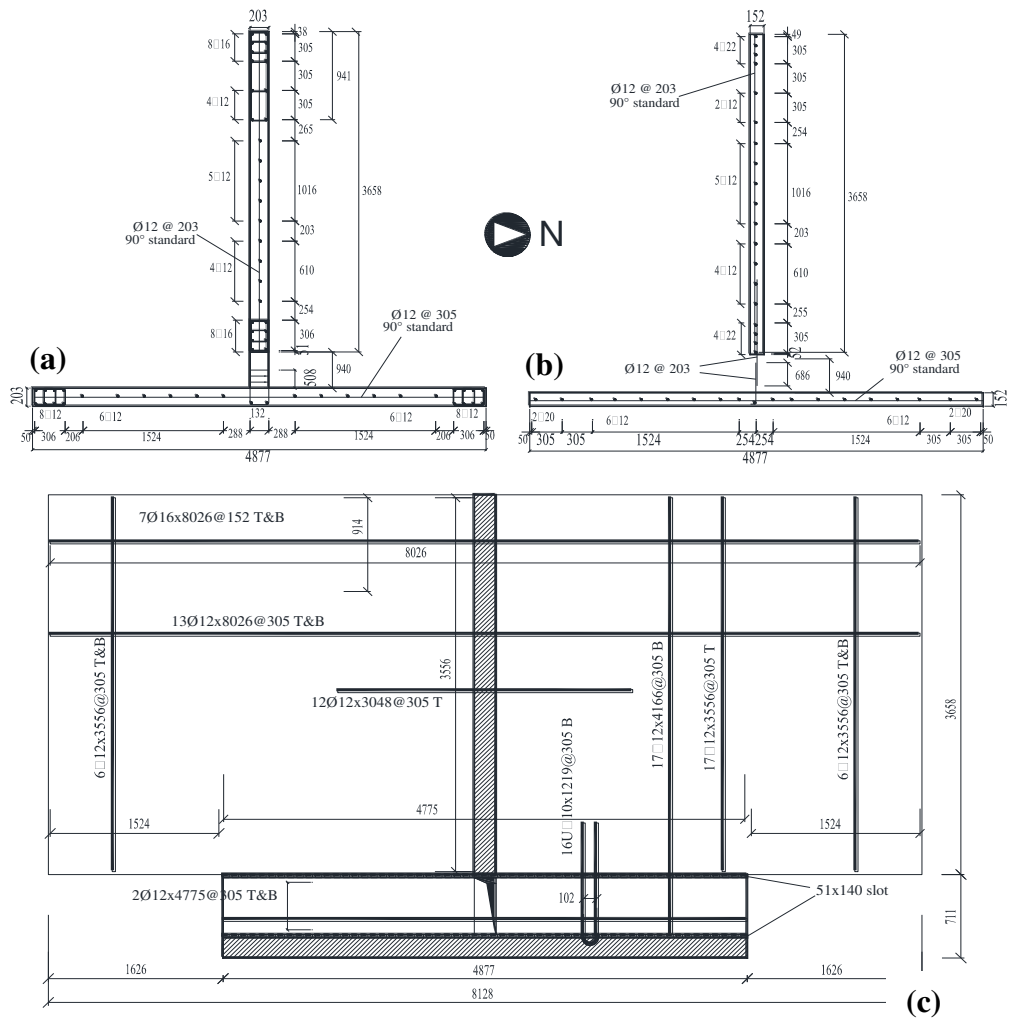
Reinforcement details for the test structure: (a) web and flange walls at first level; and (b) web and flange walls at levels 2-6; and (c) floor and link slabs at all levels
